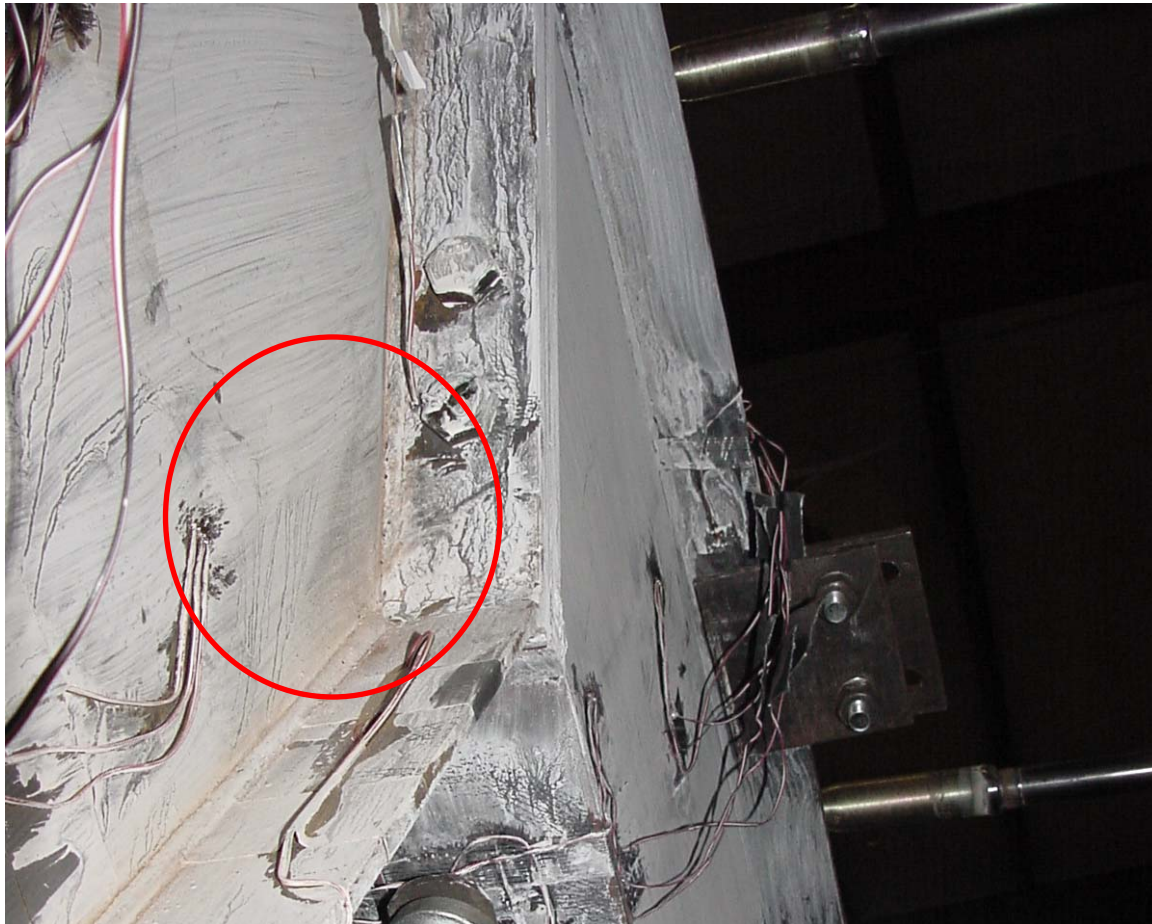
SH-1-3 Possible Web Crippling At Reentrant Corner
